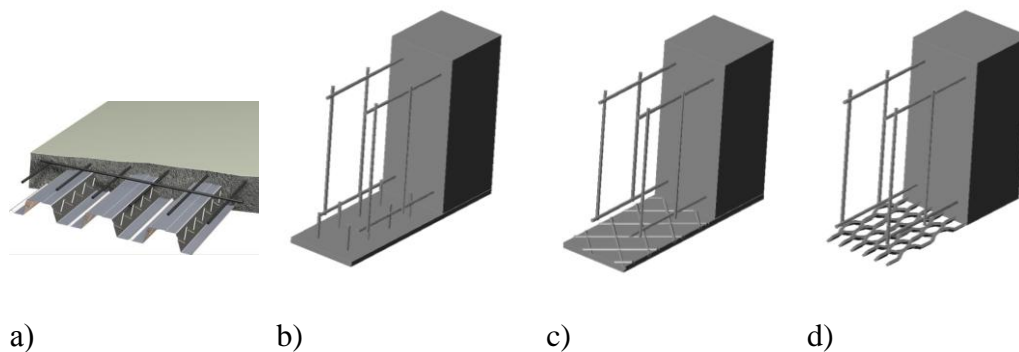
Application of reinforcement sheet as working one in the reinforced concrete structures: a) profiled flooring; b) smooth sheet fittings with short anchor rods; c) corrugated sheet fittings; d) expanded metal sheet
